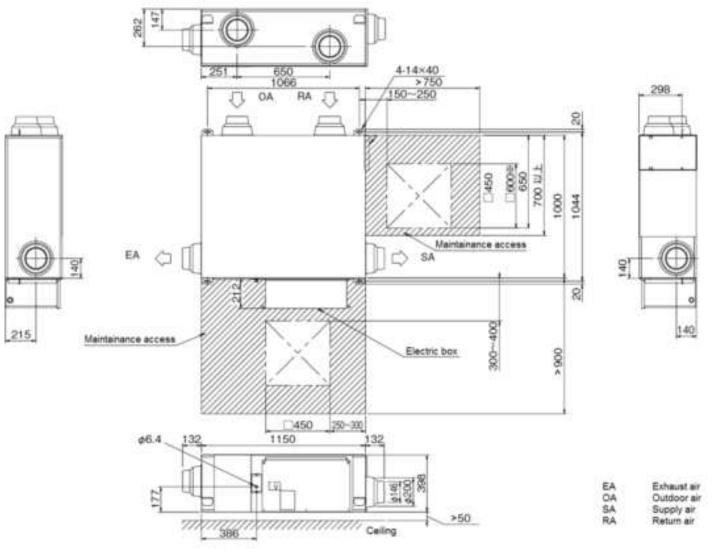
THE DIMENSION AND INSTALLATION REQUIREMENT OF THE DESICANT
